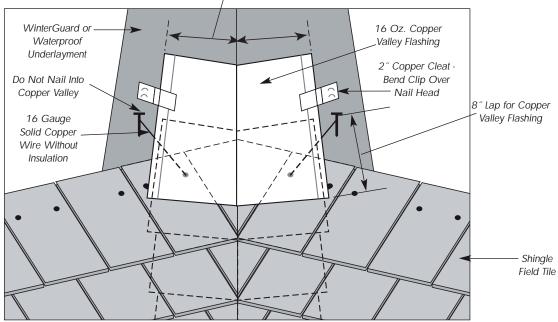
Typical Closed Mitered Valley for Flat Shingle Tile with Stepped Flashing
